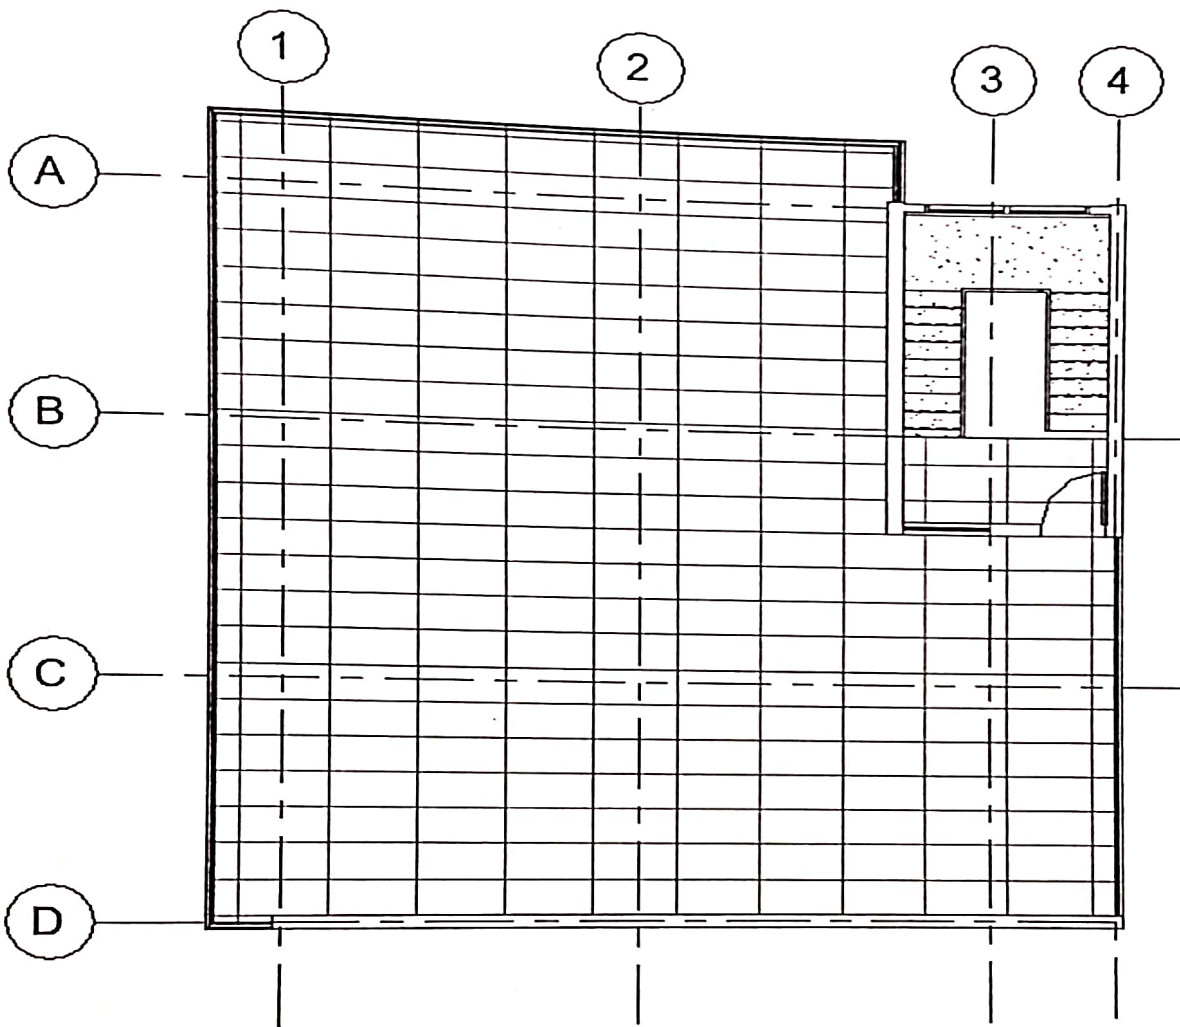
5<sup>TH</sup> LEVEL PLAN
